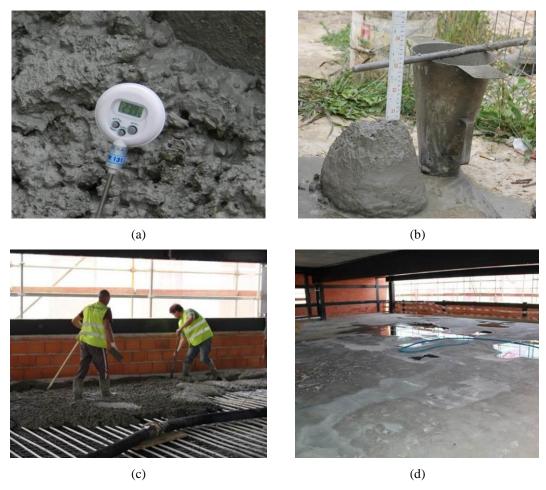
Stages of the concrete screed execution: (a) concrete temperature, (b) slump test, (c) pumping and concrete application, (d) concrete applied before the finishing
